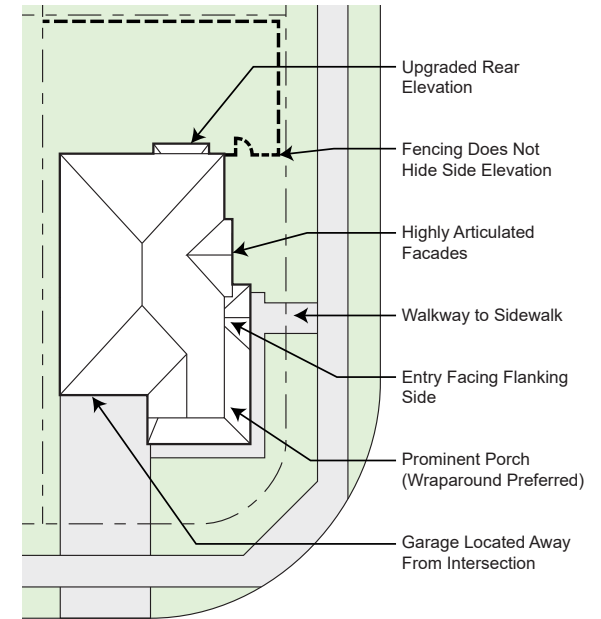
Conceptual plan view of Corner Lot Dwelling
